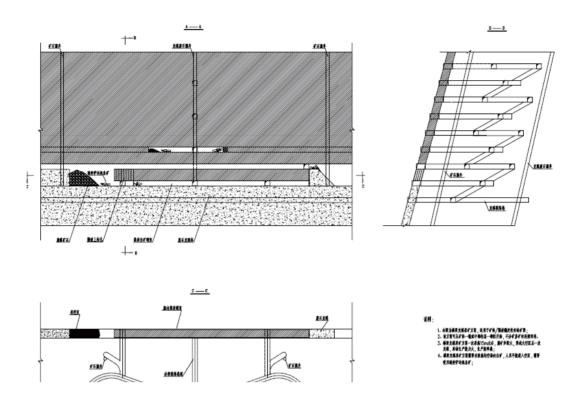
Conceptual Dong'an Upward Horizontal Layered Filling Method at Dong'an Mine (Source: Heihe)
